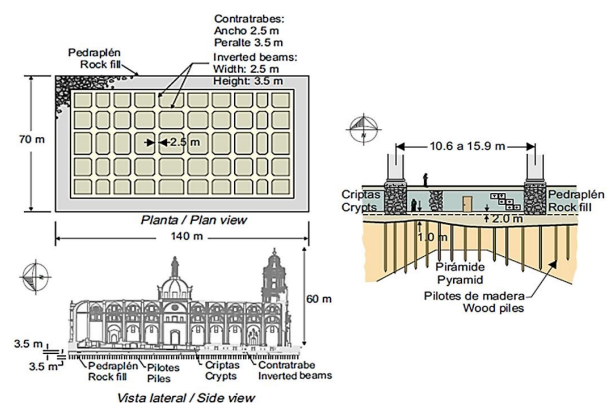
Foundation of the Metropolitan Cathedral (Ovando Shelley y Santoyo Villa, 2019).
